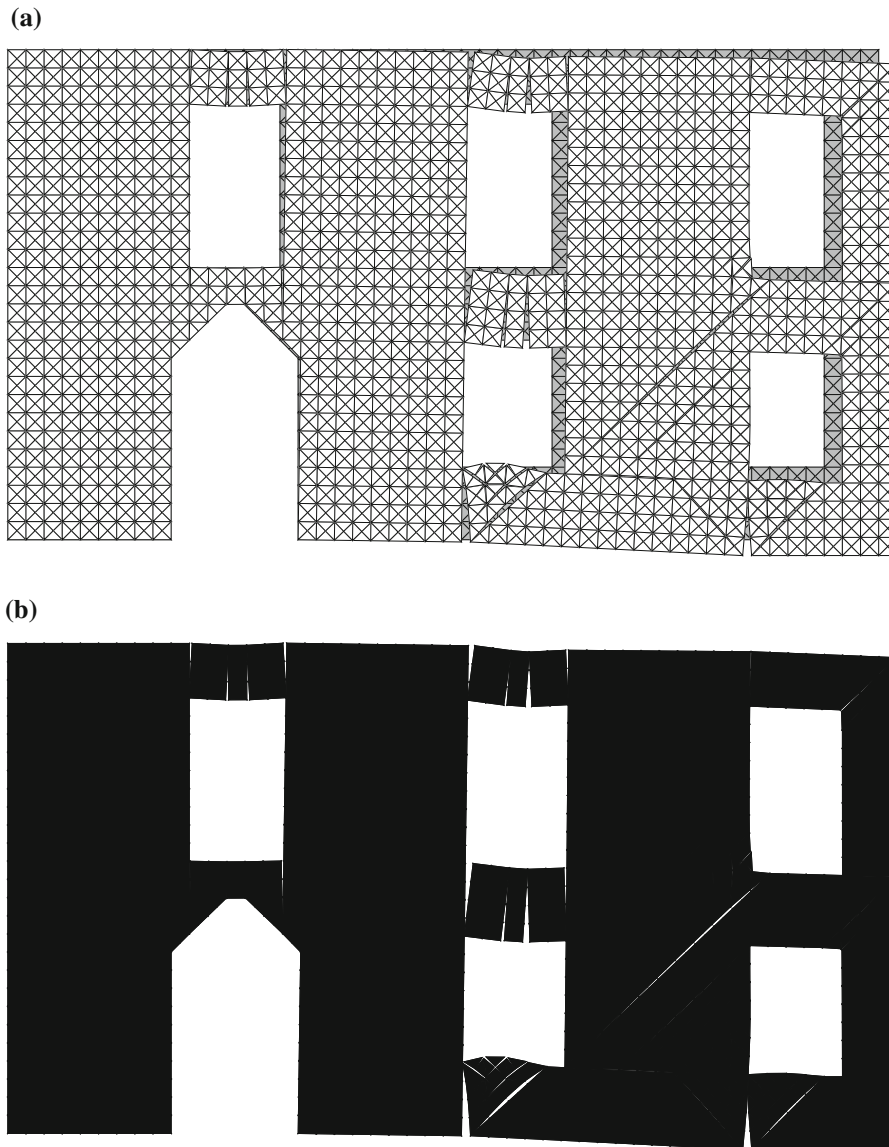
Crack pattern of façade wall with openings due to a given ground settlement: a superimposed original and deformed configurations; b silhouette of the deformed configuration highlighting the crack pattern
